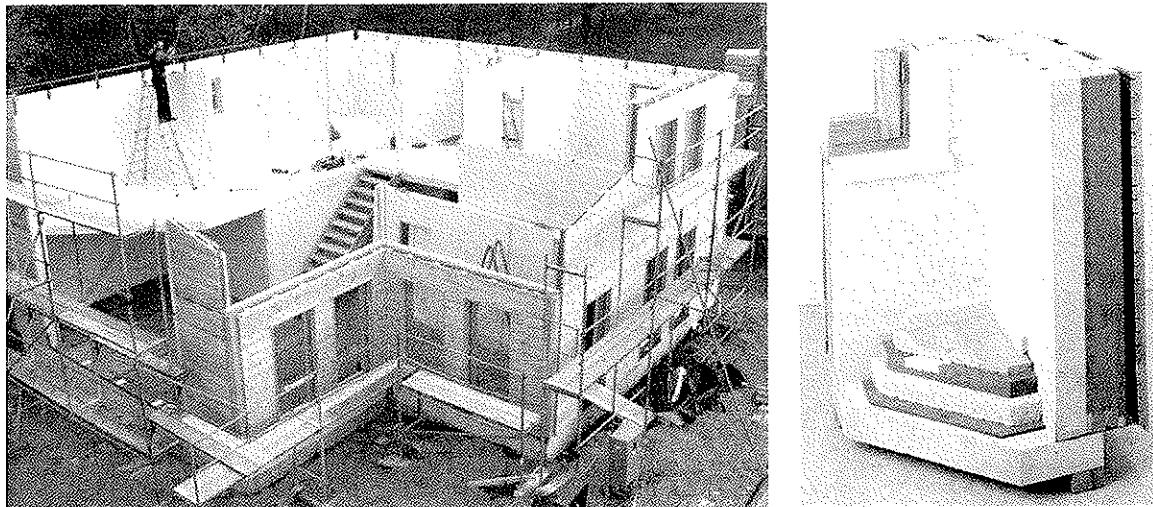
Assemblage of prefabricated large panels system (a) and corner detail of load-bearing construction with interior and exterior finishes (b).
